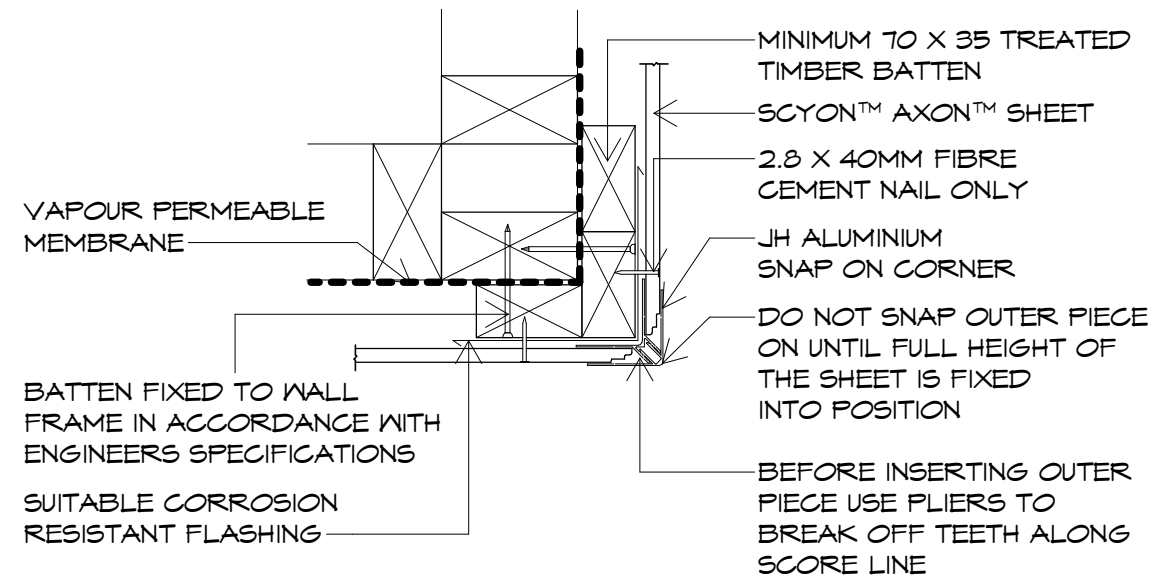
VERTICAL JOINT - EXTERNAL CORNER ON BATTENS
